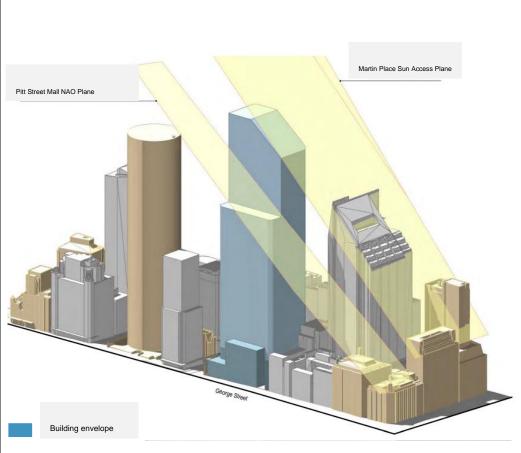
Western Site Solar Access Modelling (Urban Design Report) showing Pitt Street Mall No Additional Overshadowing Plane and Martin Place Sun Access Plane as defined by Sydney LEP 2012 Heritage
